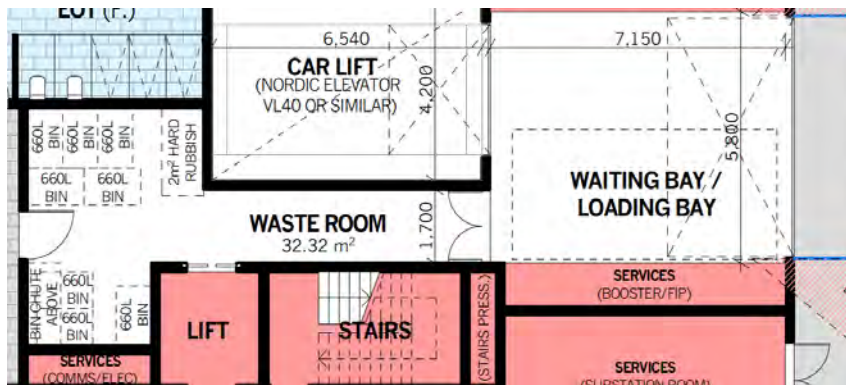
Waste room on ground floor, with loading bay for collection purposes
